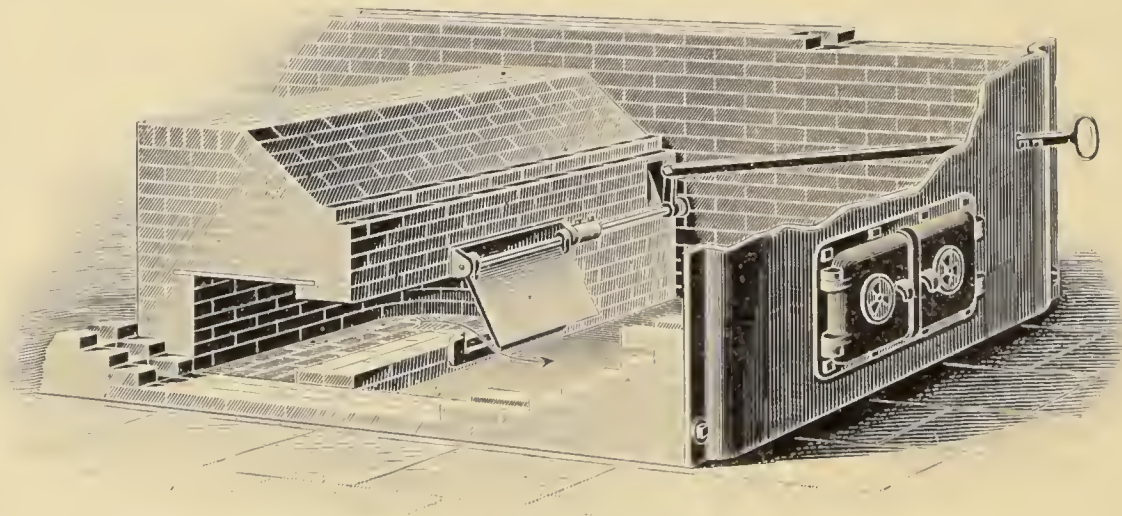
STURTEVANT ASHPIT DAMPER IN BRIDGE WALL.
